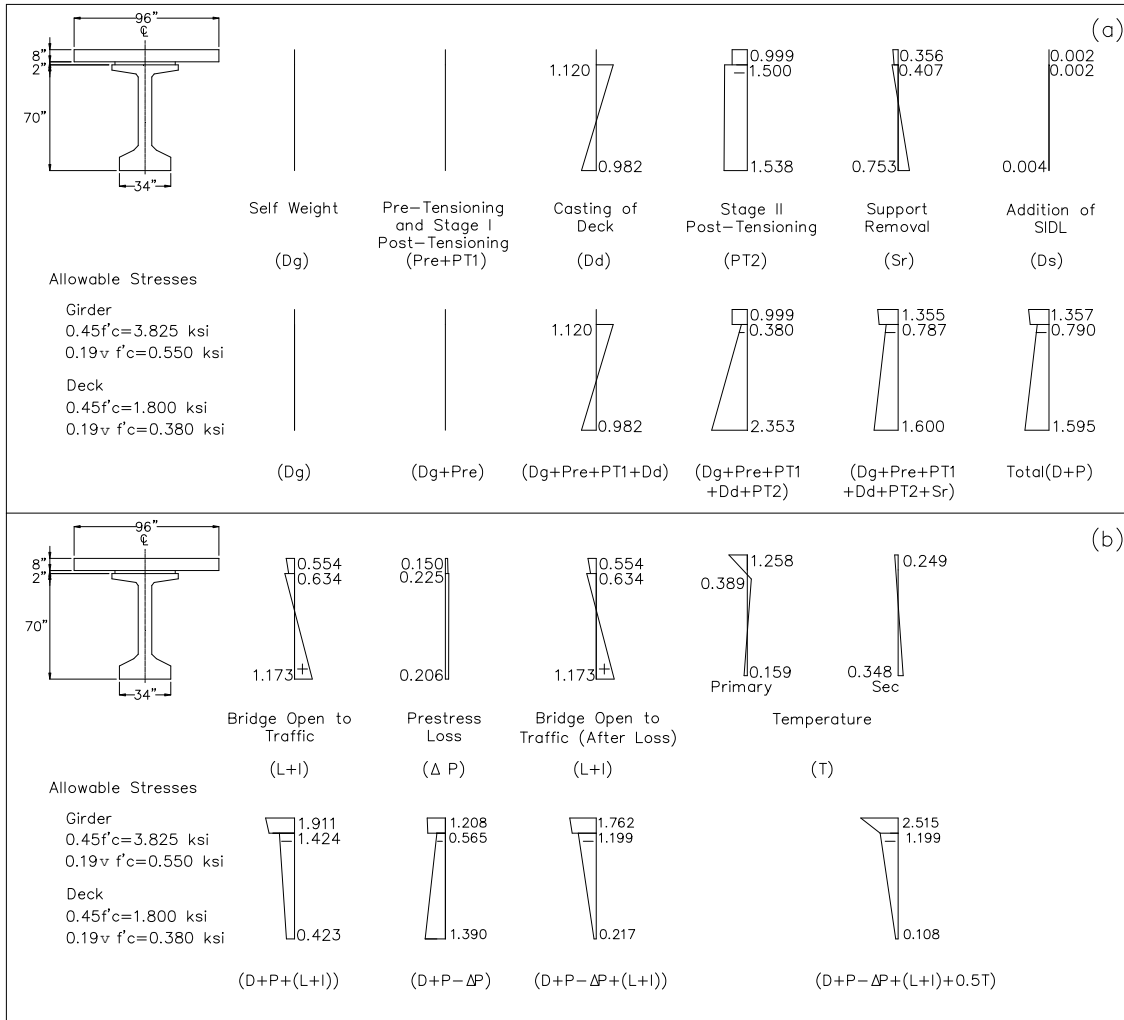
Stress Check at Section B-B (Splice in Exterior Span) for (a) Construction and (b) In-Service before and after Losses.
